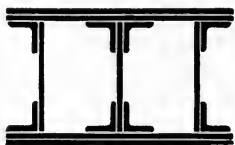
Heavy Column Section. Park Row Building, New York.
